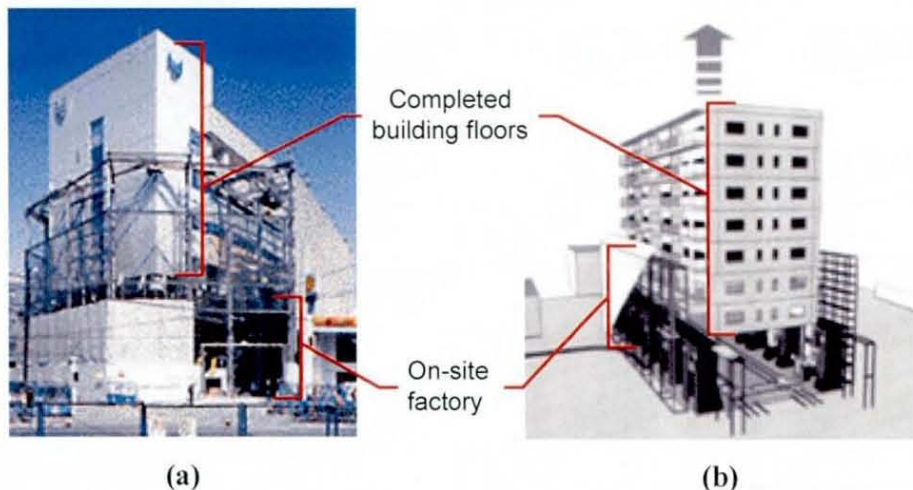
AMURAD system of Kajima Corp.: (a) on site factory fixed at building ground level; (b) completed floors are raised from ground factory.
